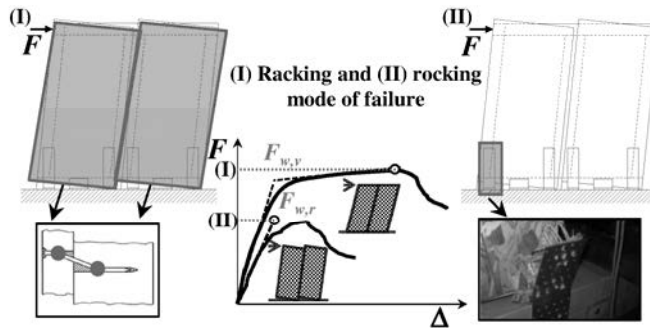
Racking and rocking mechanisms for framed timber wall structures (from Loss et al. 2013).
